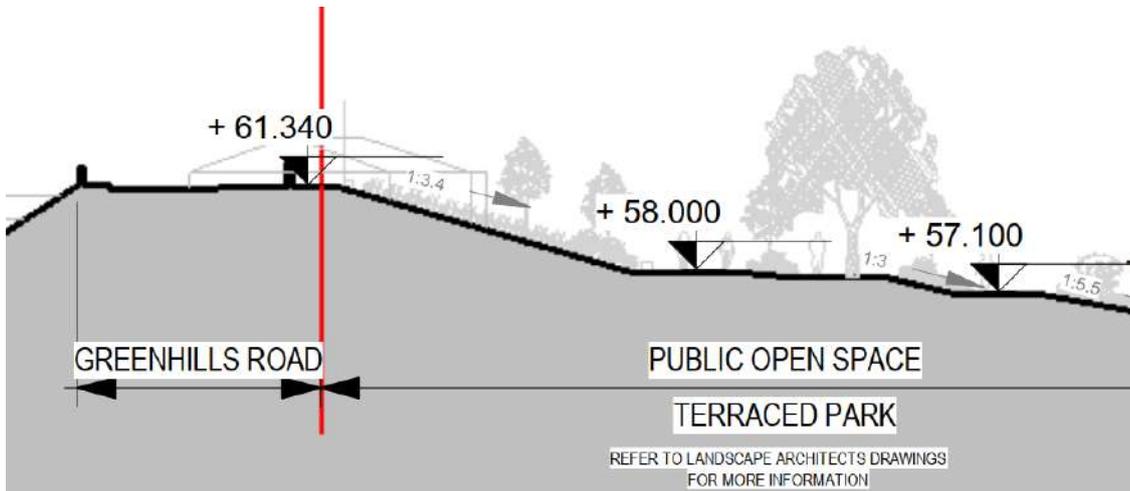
Proposed Contextual Section 3-3 (Refer to C+W O'Brien Drawing no. PE18001-CWO-ZZ-ZZ-DR-A-001300 Section 3-3)
